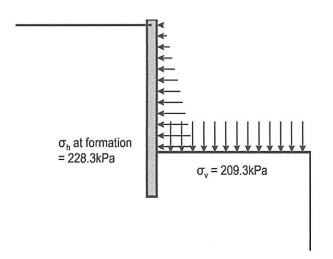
Imposed horizontal and vertical total stresses acting within excavation during consolidation on the centrifuge
